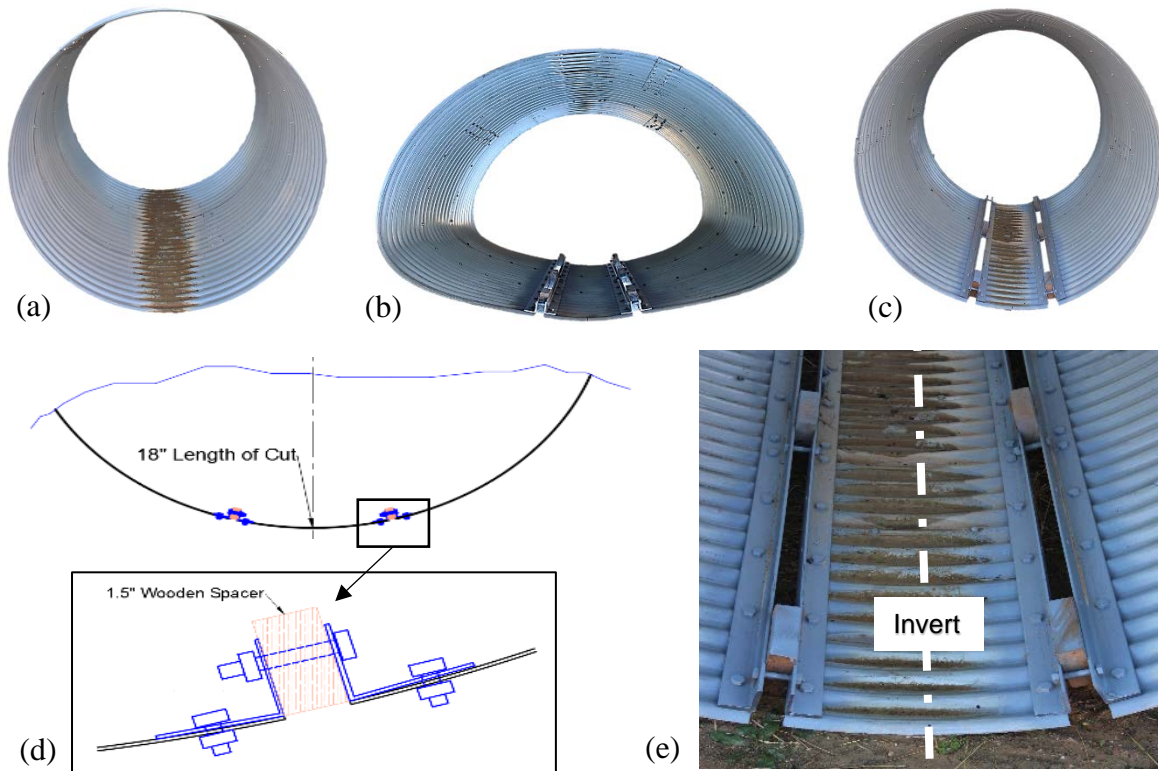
Control test CMP samples: (a) intact circular CMP, (b) invert-cut pipe arch CMP, (c) invert-cut circular CMP, (d) detachable invert section layout, and (e) invert cut section with detachable fasteners.
